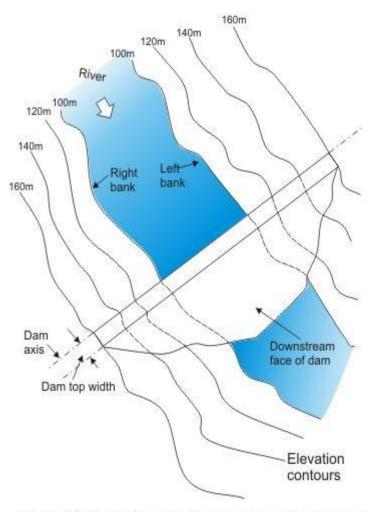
A typical layout of a concrete gravity dam in plan.
